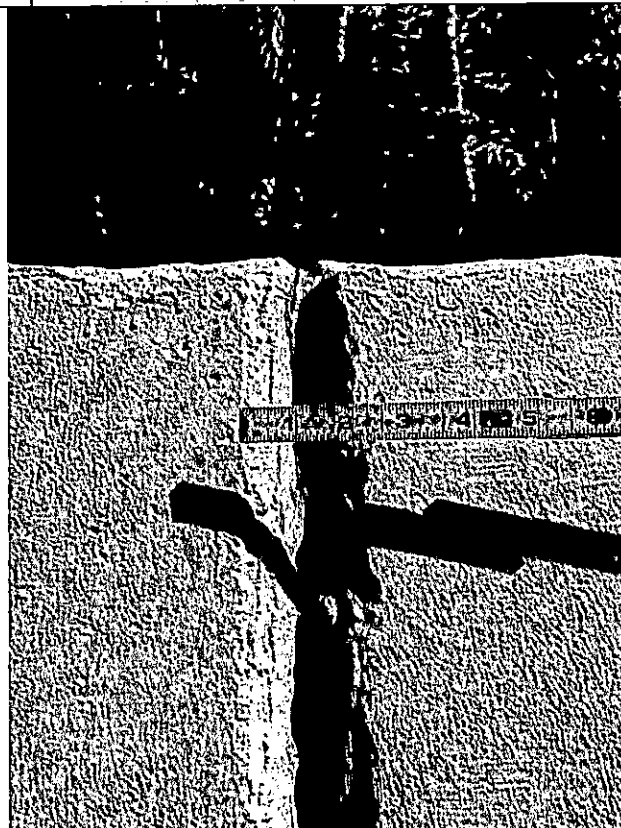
DESCRIPTION	2" JOINT IN RETAINING WALL (TYPICAL)
